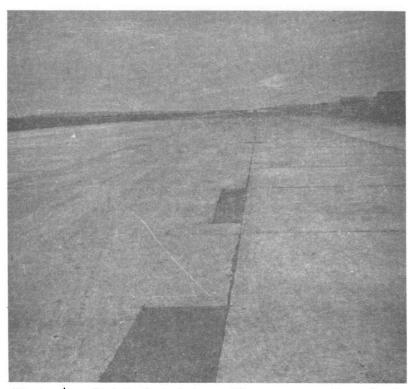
Patched joint spalls near north end of taxiway 26 (feature T4A)
